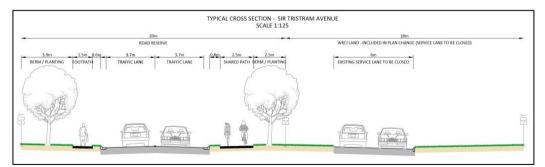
Typical Sir Tristram Ave Cross-section with Proposed Changes
